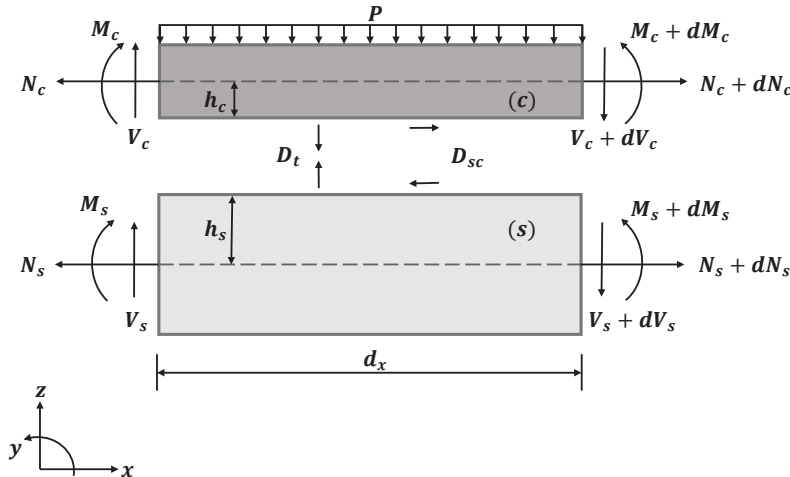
Diagram of a two layered composite beam element where (c) and (s) are the concrete slab and steel girder, respectively.
